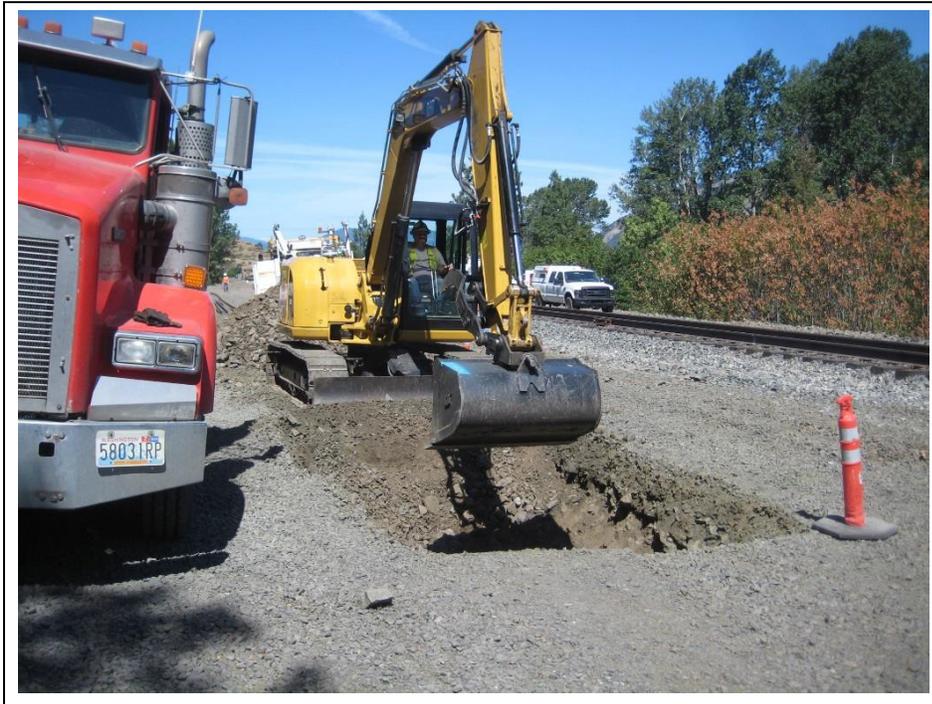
Overview of excavation south of railroad tracks. Aspect: west.
